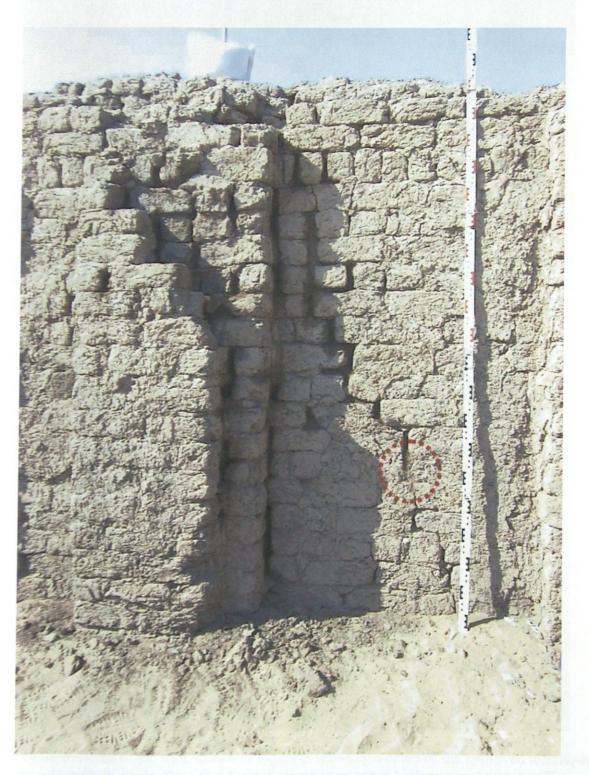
Cracks filled on a rear of the east elevation of the East Enclosure Wall that will serve as the approved panel for similar work. This is the same area as Figure 3. See Figure 6 for a detail of the area in red.
